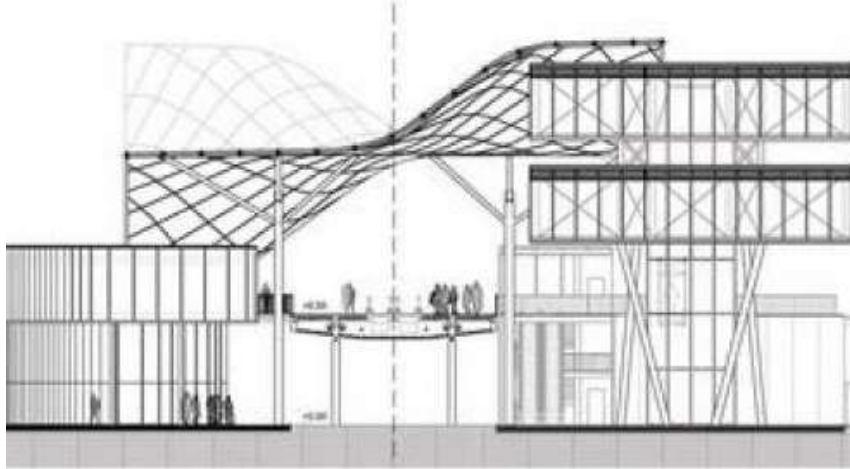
New Trade Fair Milan – Milano Fiera
